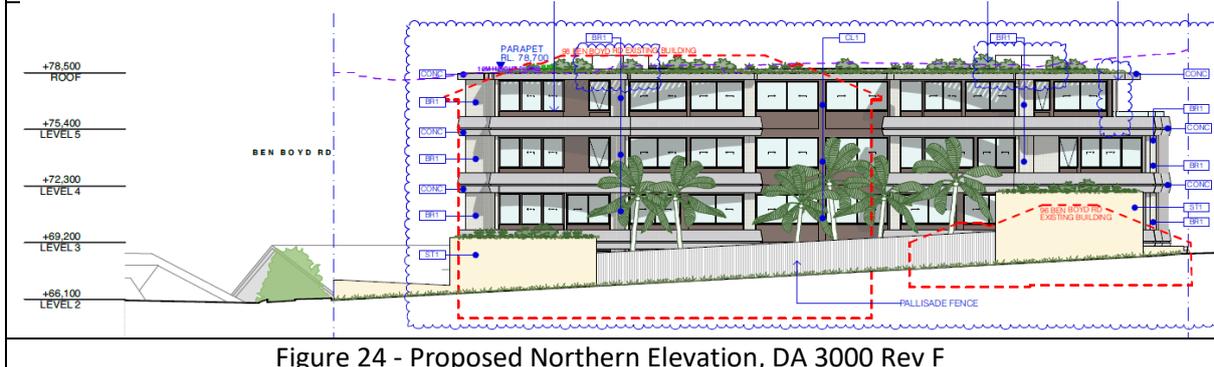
Proposed Northern Elevation, DA 3000 Rev F
